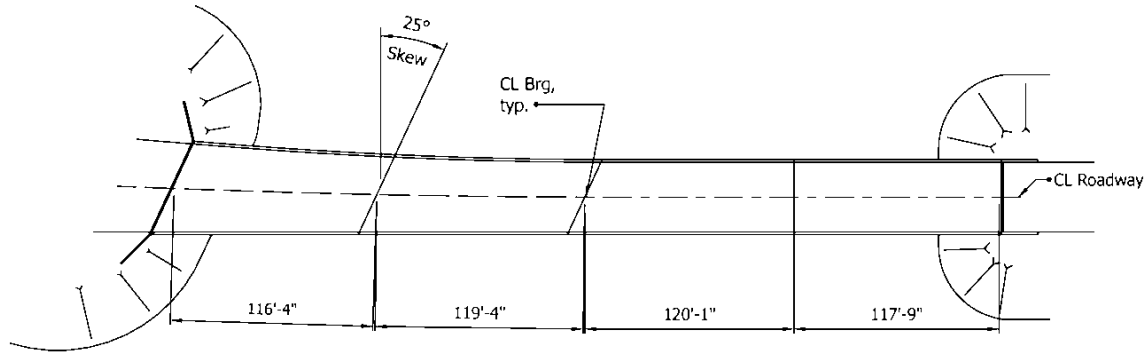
Plan view of a four-span bridge with variable skews (Example 1)
